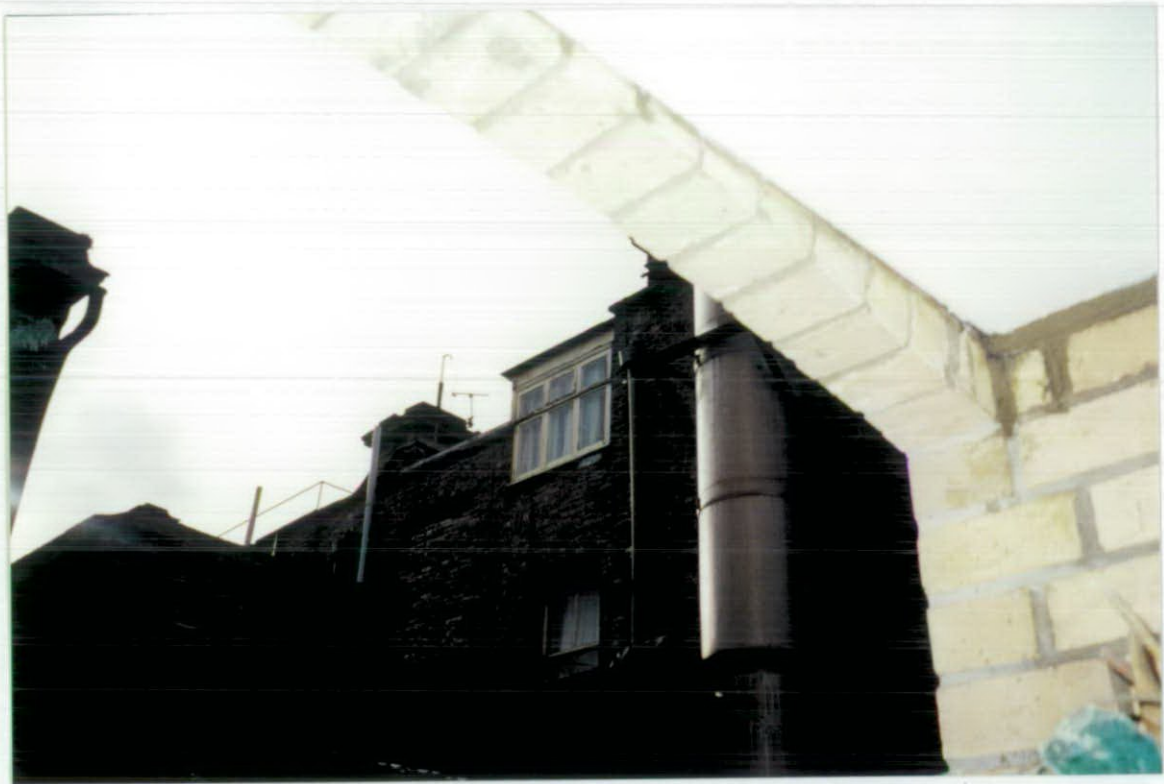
Rear elevation of no. 1, De Vere Gardens, existing roofline, view from adjoining residential property
